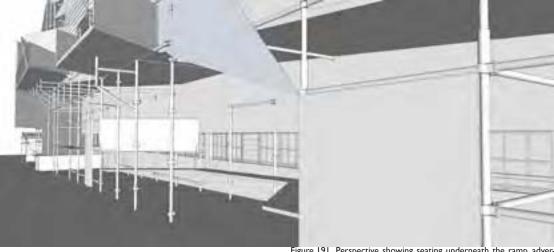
Perspective showing seating underneath the ramp, advertisement boards & covered space to be appropriated by informal traders (Author ,2010)
